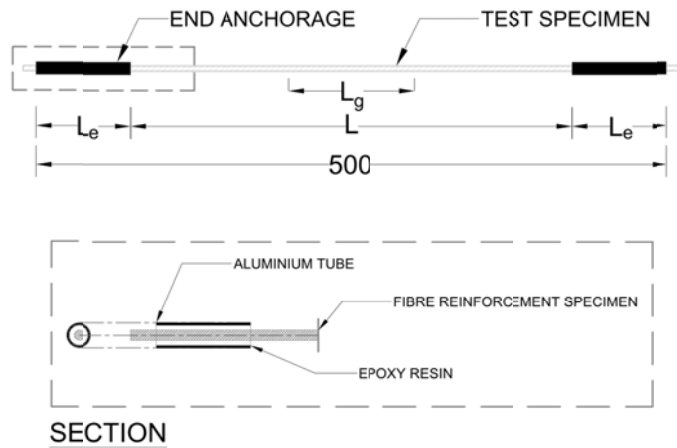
Geometry and layout of a tensile test specimen with end anchorage.
